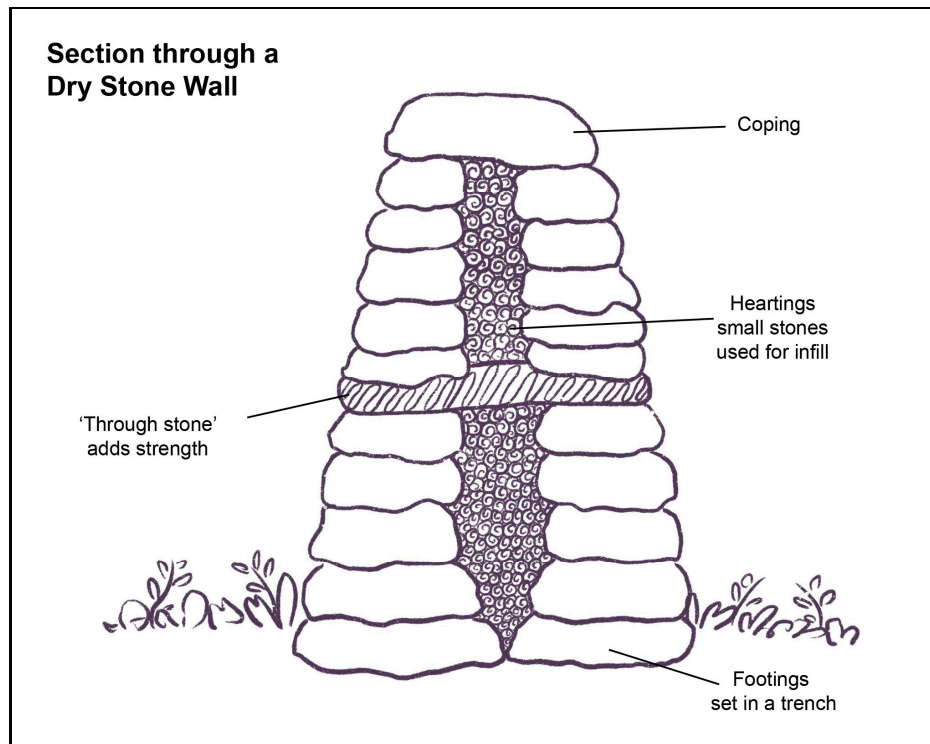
A section through a Dry Stone Wall. The restoration of any Dry Stone Wall should seek to replicate the character and style of the original wall as far as is practicable, adhering to good practice to ensure longevity, and not follow a set template.
